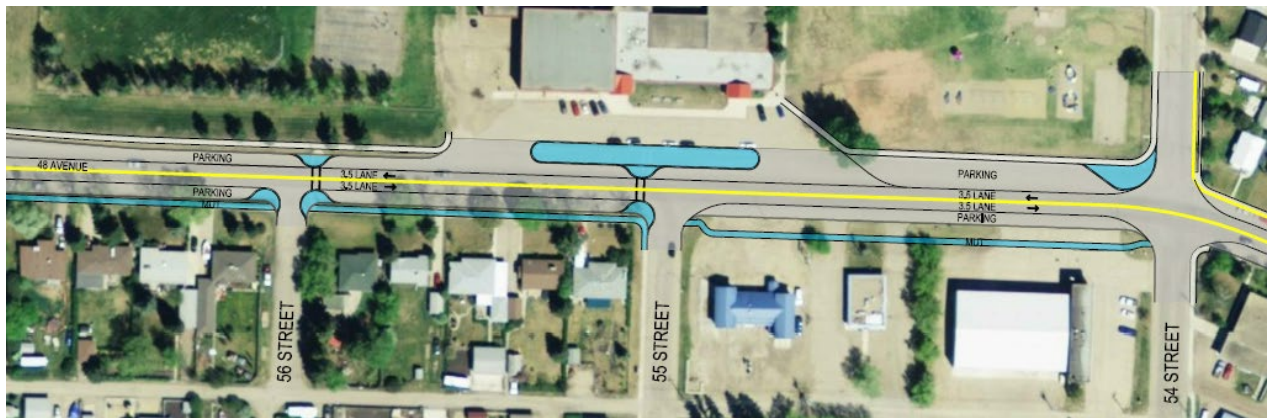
48 AVENUE CORRIDOR PROPOSED CONCEPT IMPROVEMENTS
